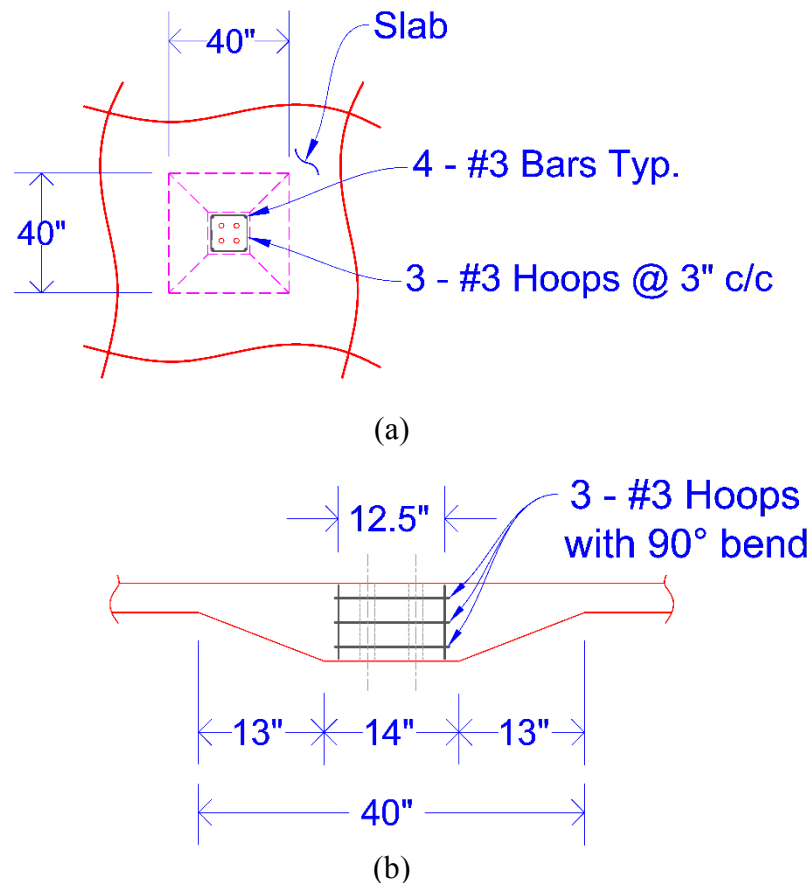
Schematic of the extra reinforcement provided at drop panel locations, (a) plan view, and (b) cross section view.
